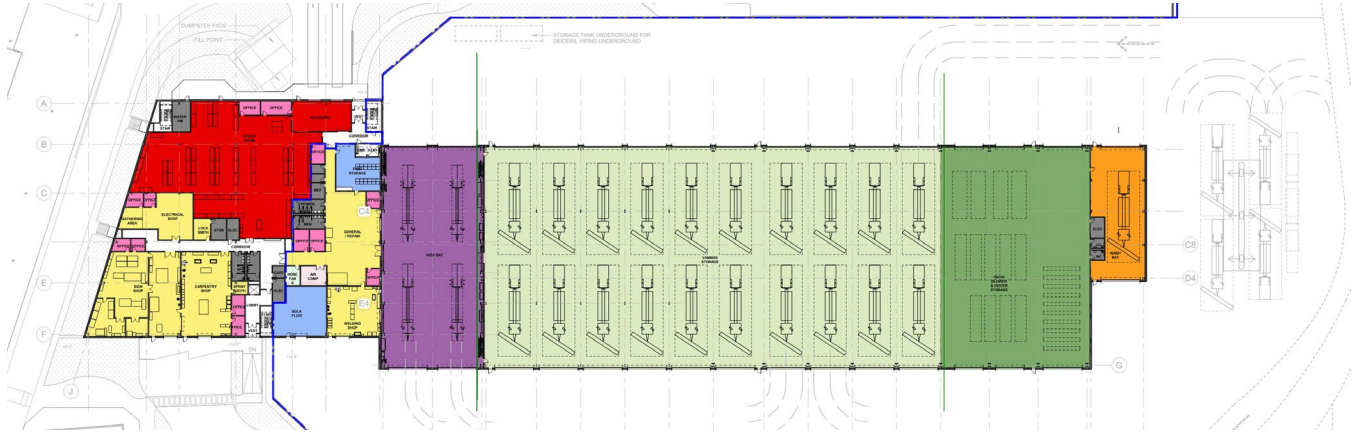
Large Vehicle Storage & Maintenance Facility second floor plan is provided to illustrate the current layout of the various functions served inside.
